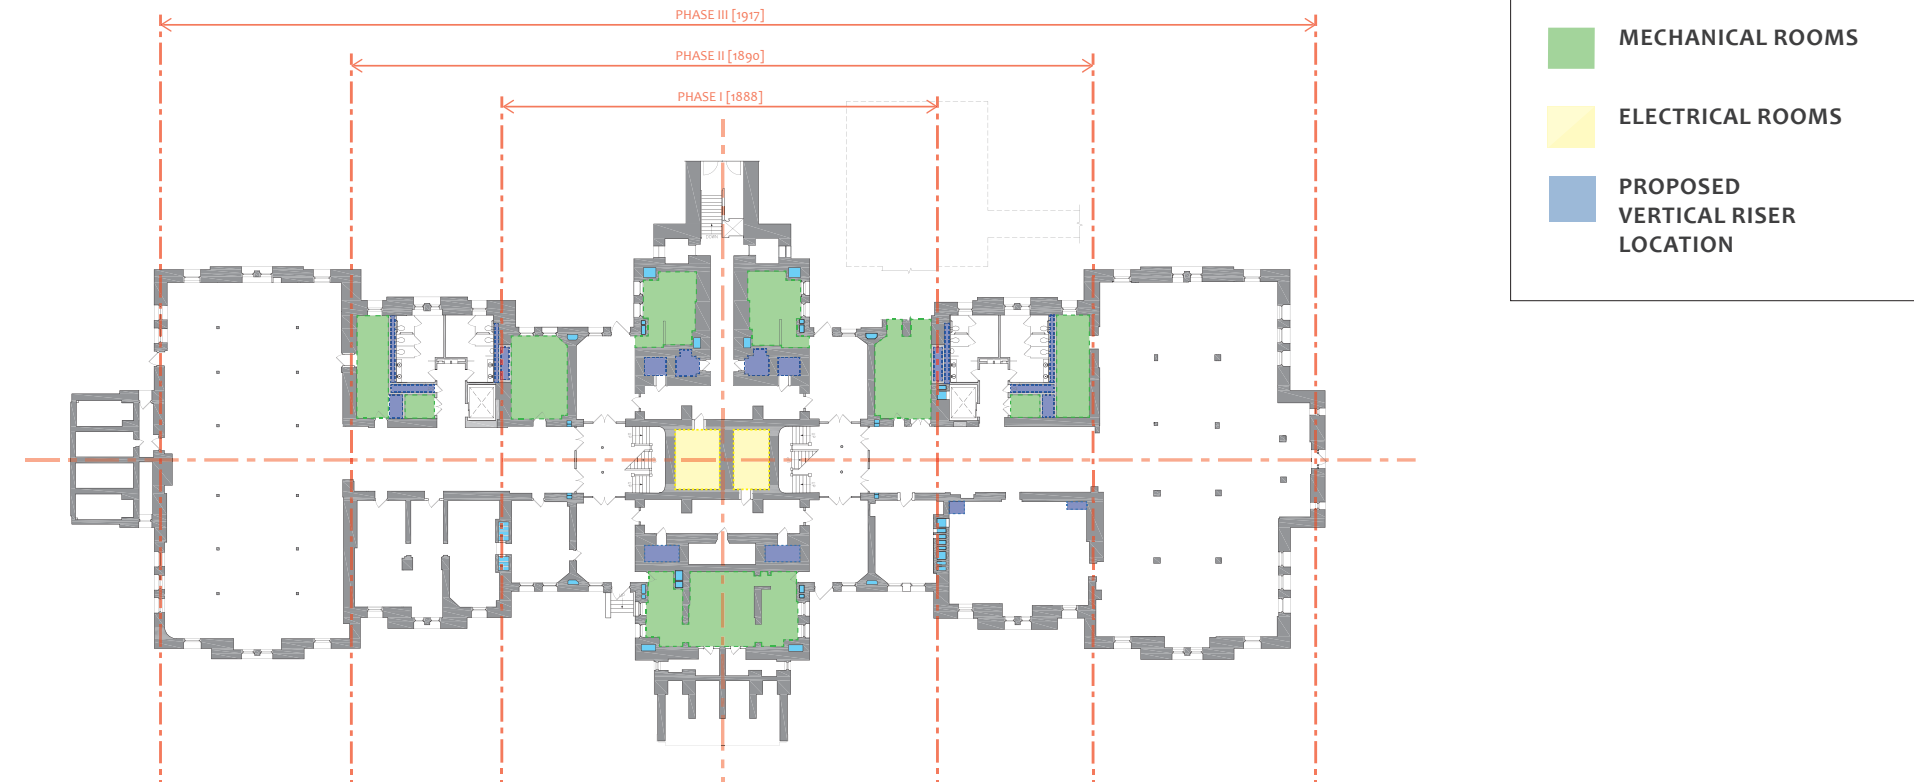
Basement Level Plan, Indicating Proposed Locations for Mechanical Rooms [Green], Electrical Rooms [Yellow] and Proposed Vertical Riser Locations [Blue].
